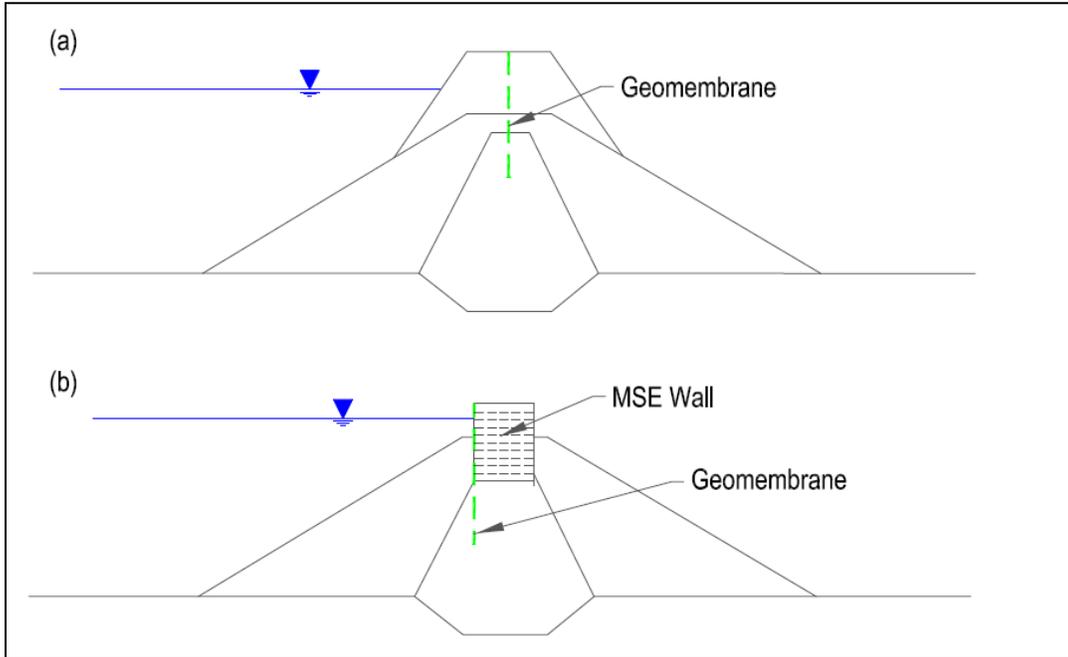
Dam raise using geomembrane: (a) vertical geomembrane installed into existing zone 1 core and (b) mechanically stabilized earth wall with vertical geomembrane facing installed into existing zone 1 core.
